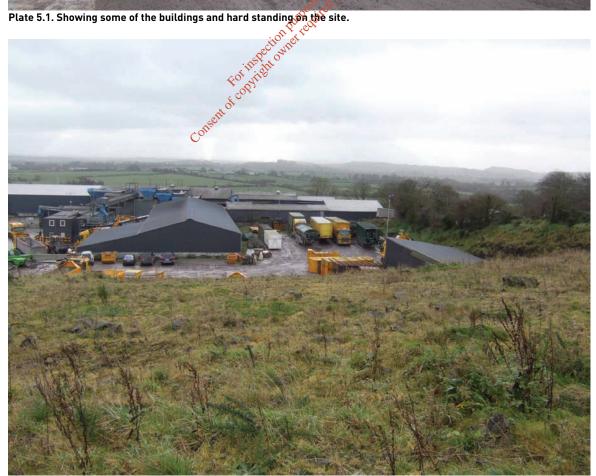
A view of the site from the north facing south, showing the existing buildings.
